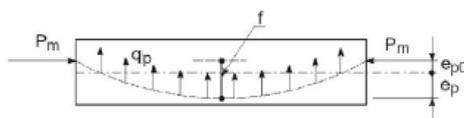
29. Statically determinate beam prestressed with draped tendons(Lansen & Kluyver, 2006)
